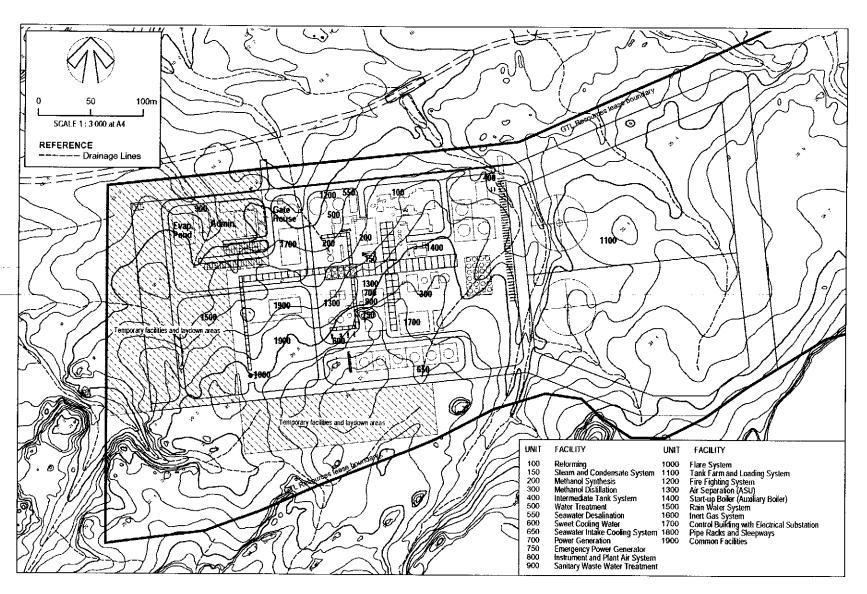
Site layout plan (Source: URS, 2002, amended Figure 4)
